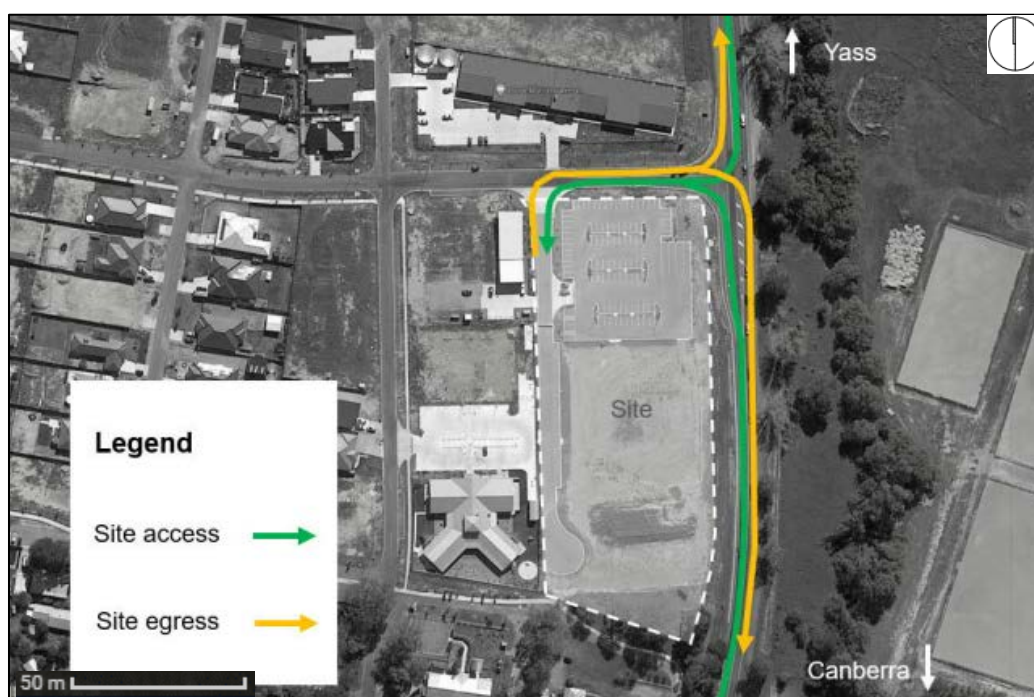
| Proposed construction vehicle routes (Base source: Applicant's EIS 2021)
